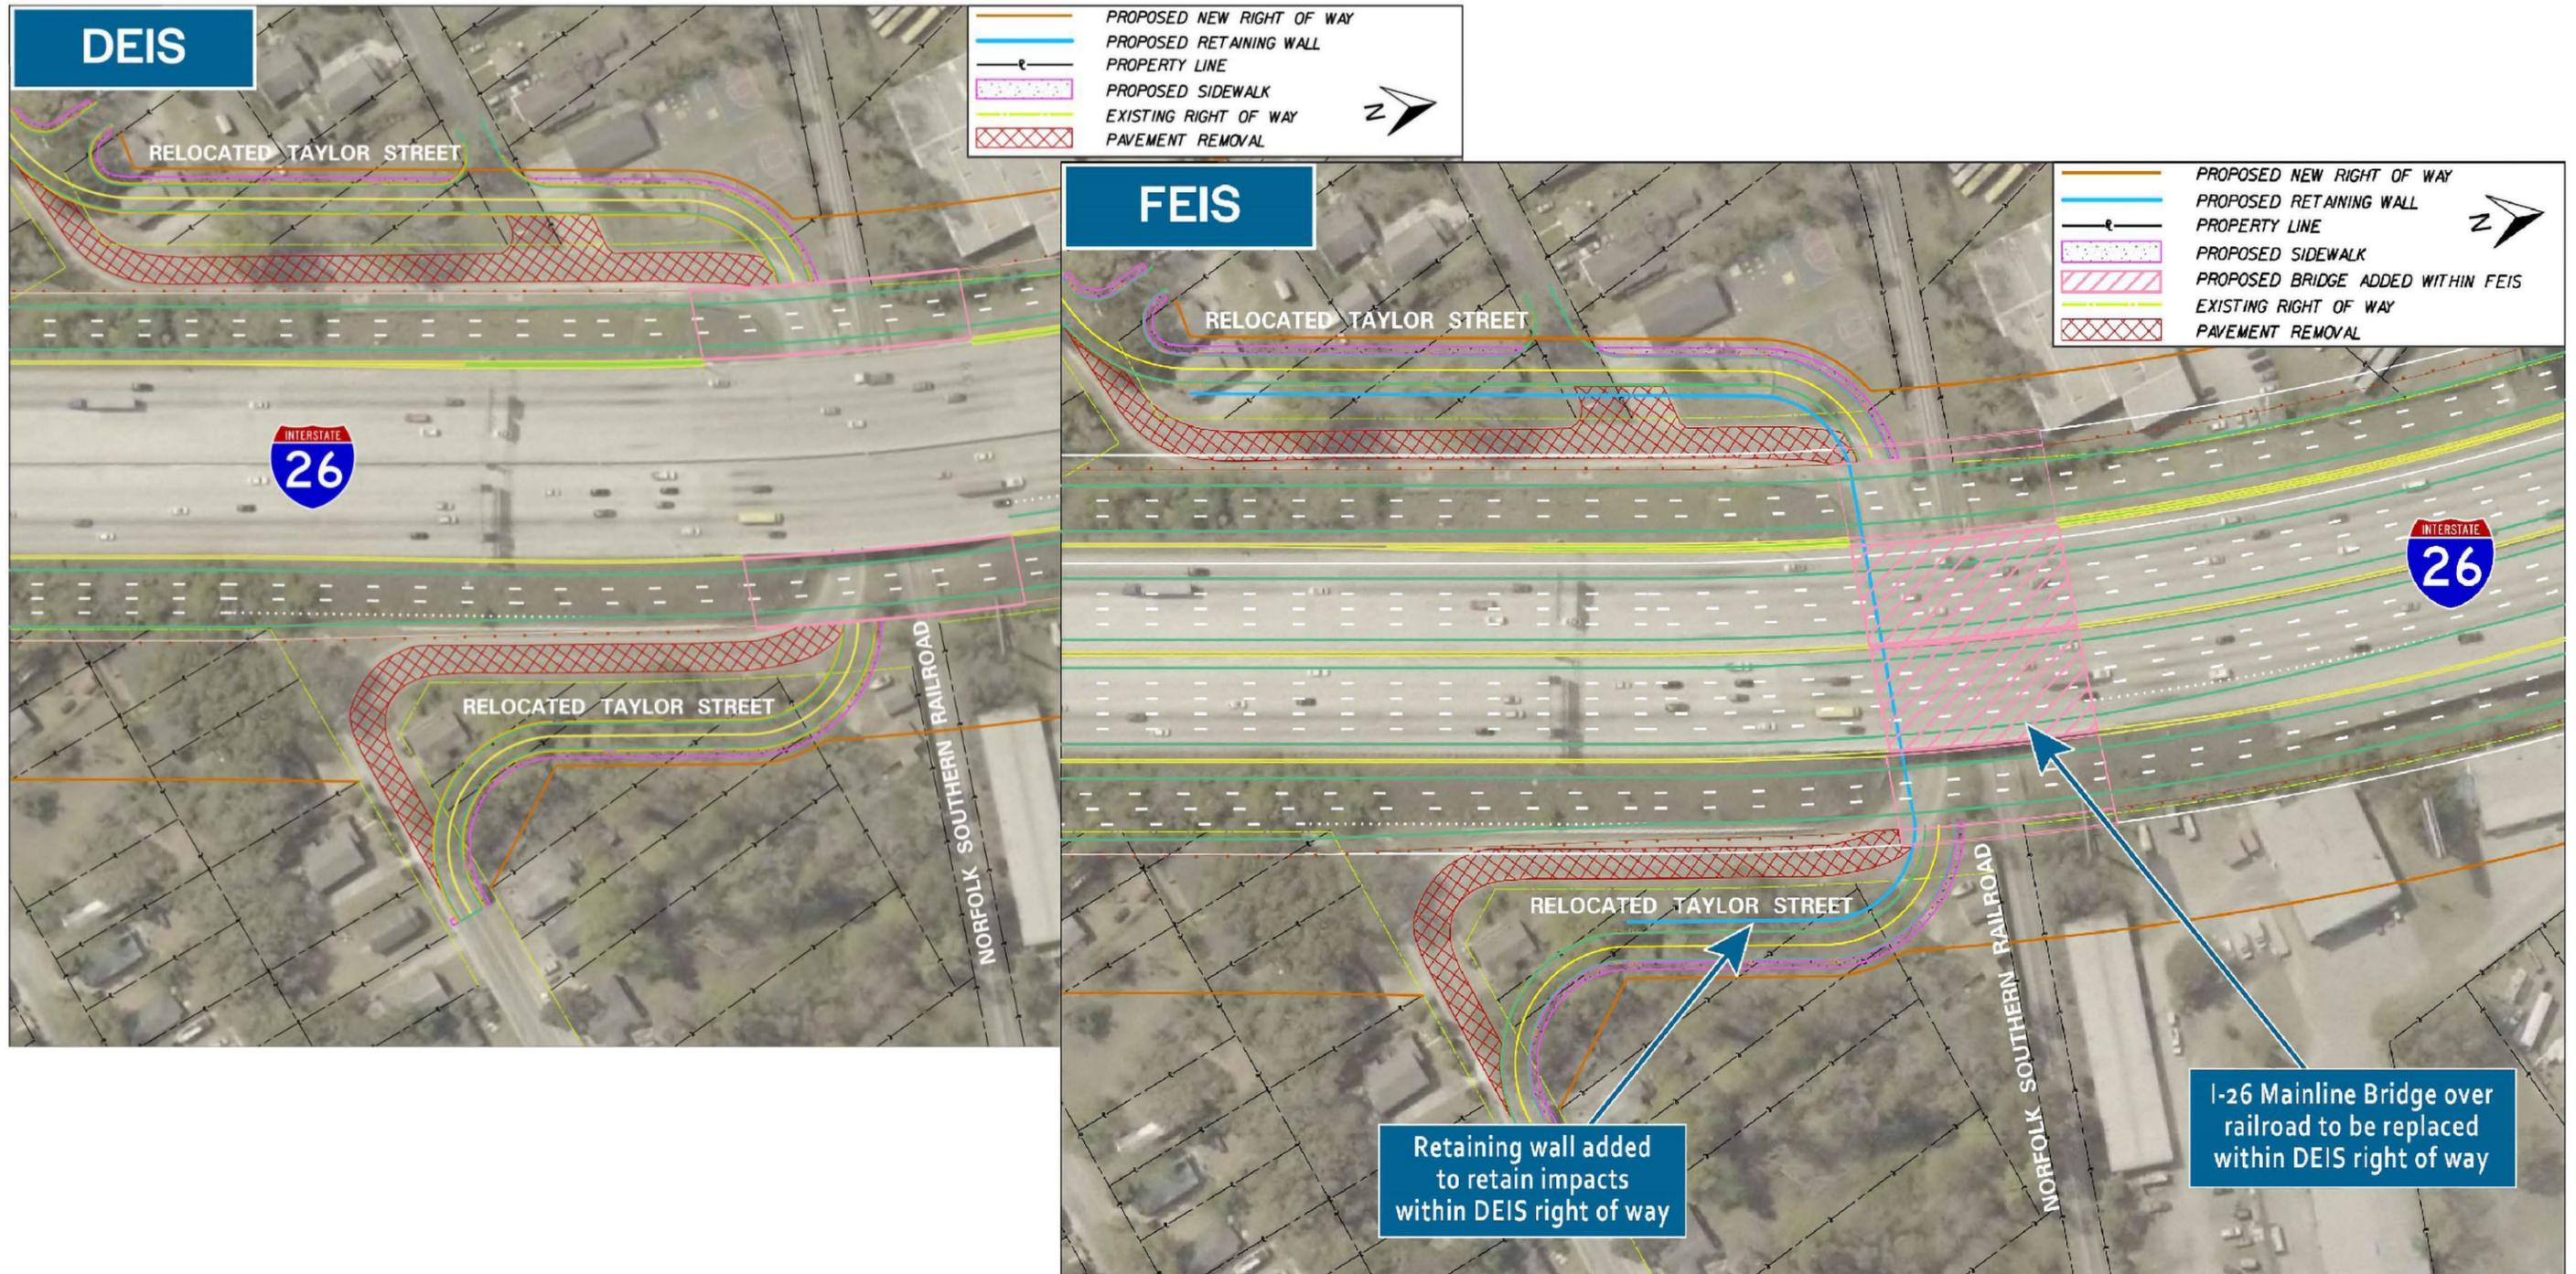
Replacement of I-26 Mainline Bridge over Railroad at Taylor Street
